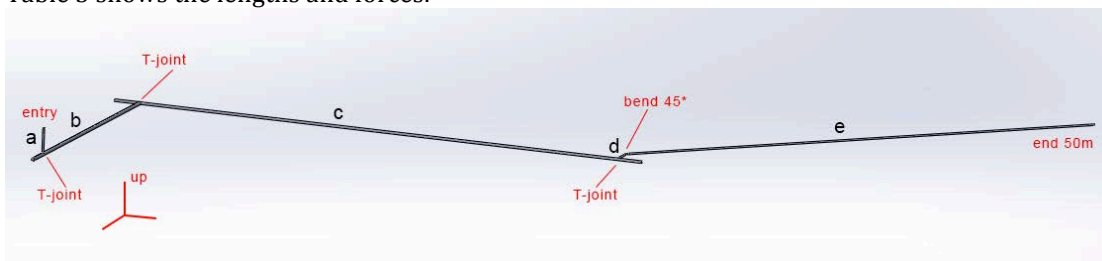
Test course 1, a fictional underground gas pipe network. All sections are horizontal except section a.
